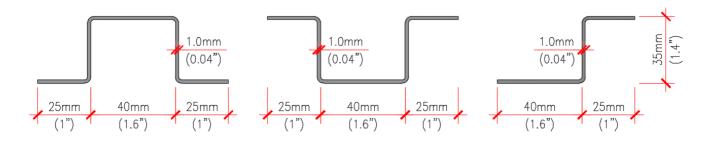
Section type of structure in galvanized steel DX51D (Z+) (Dx51D Z+ galvanized steel)
